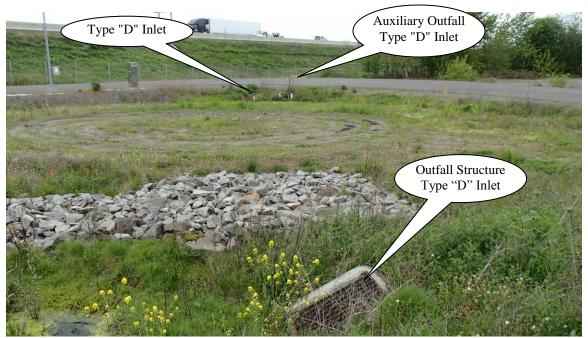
a view of extended detention pond facility, looking Southwest toward Sunrise corridor.
